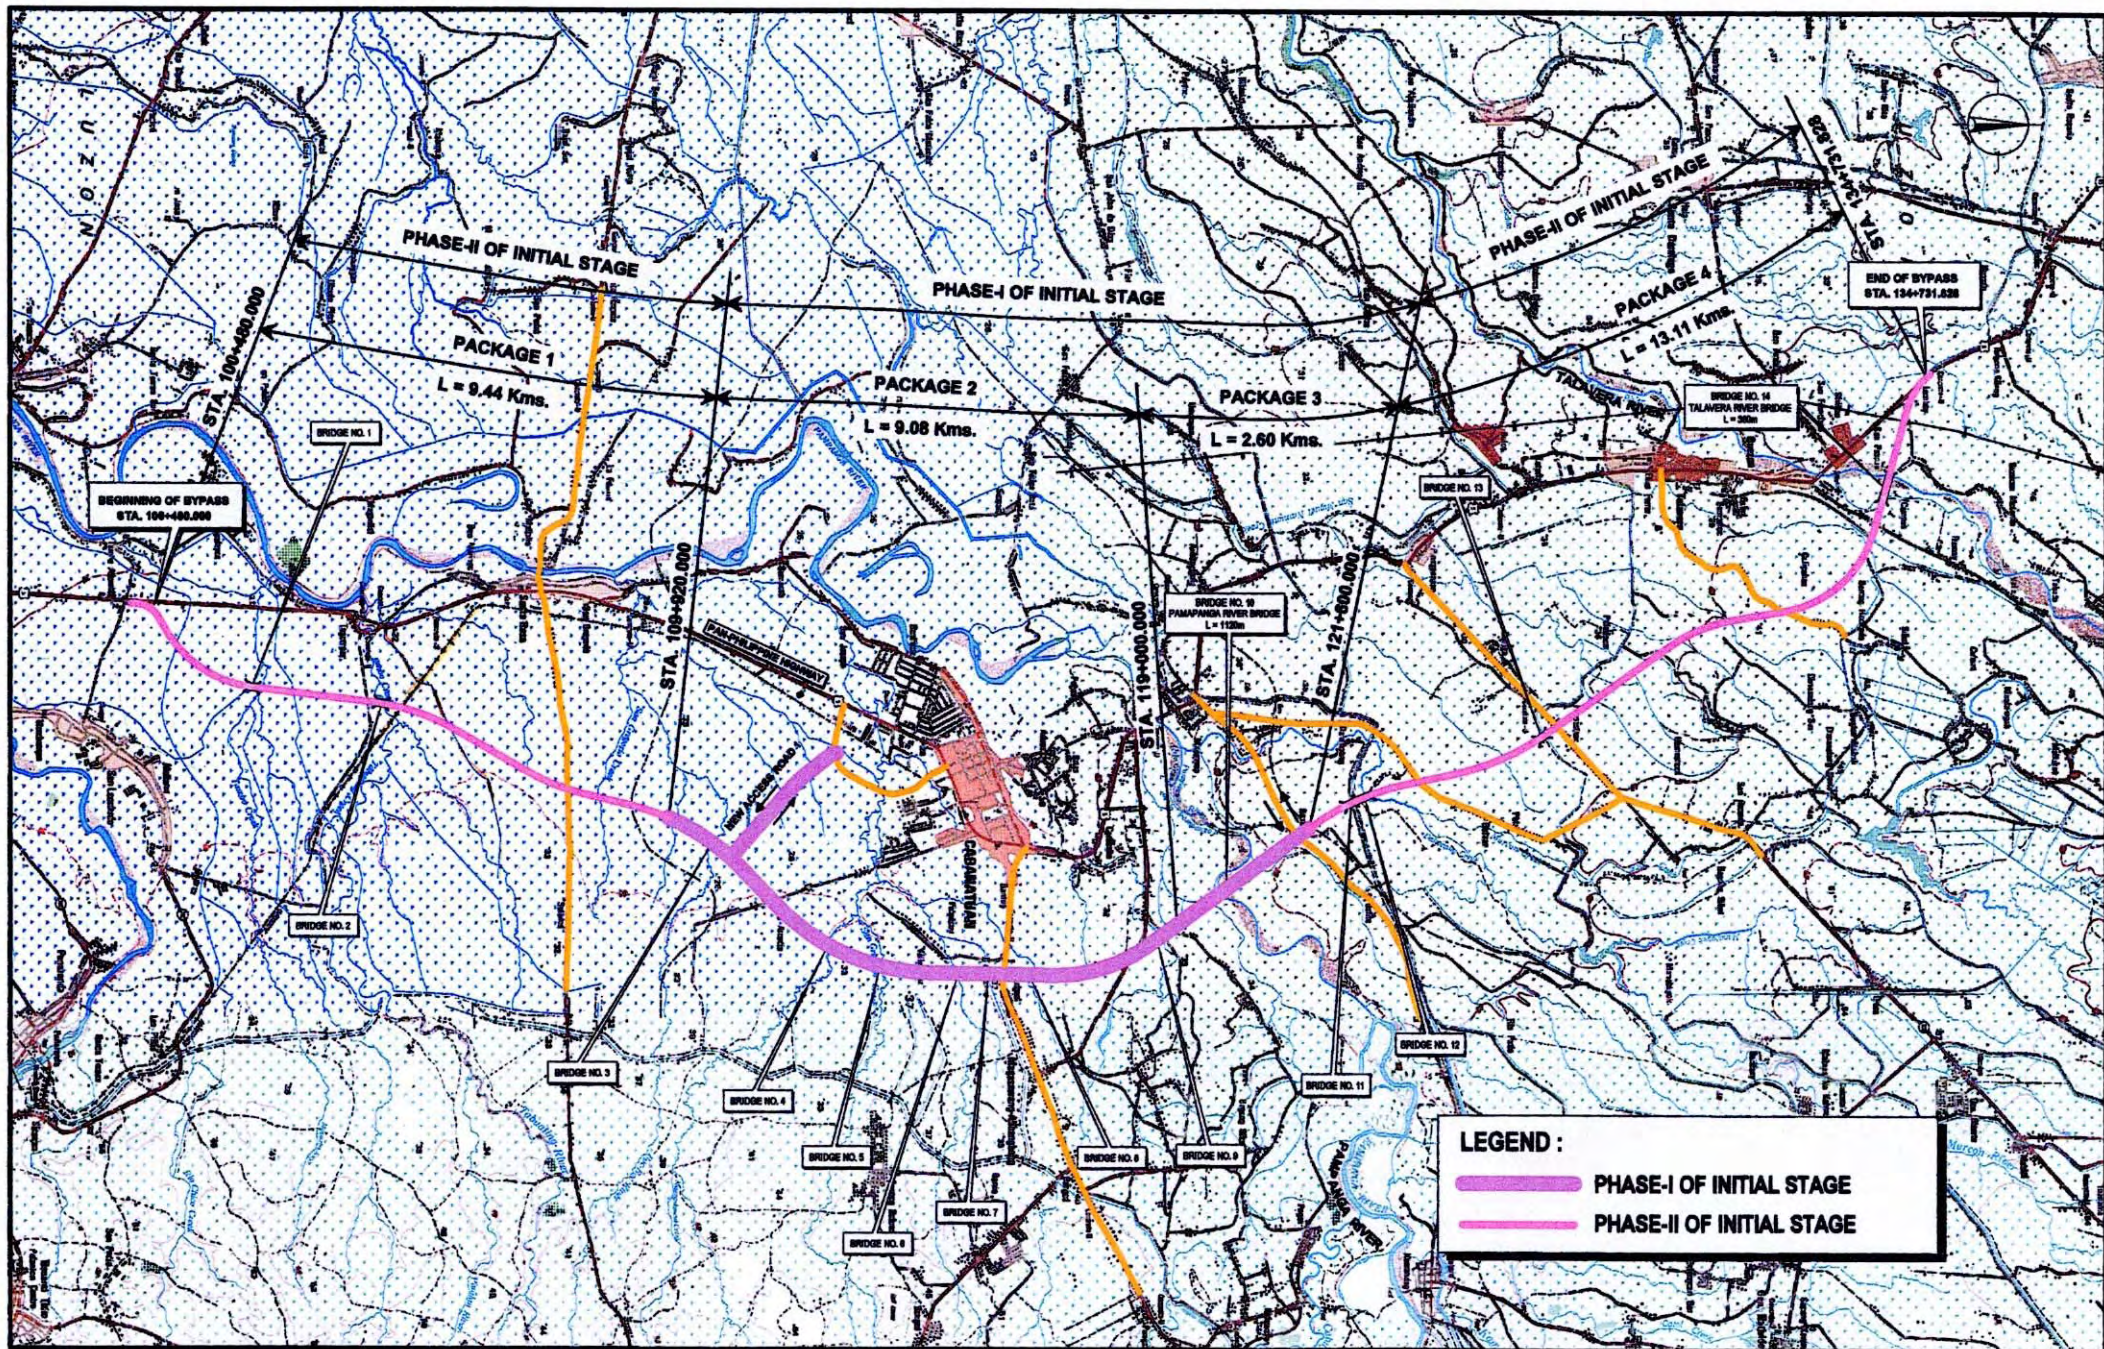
CONSTRUCTION PHASING OF CABANATUAN BYPASS
